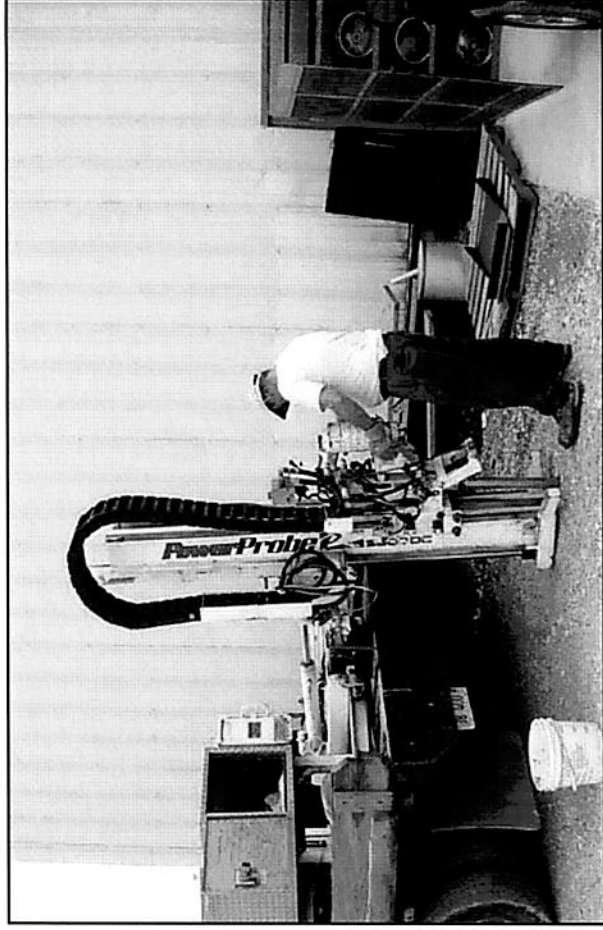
Looking north as GP-7 is advanced. 04/22/05
